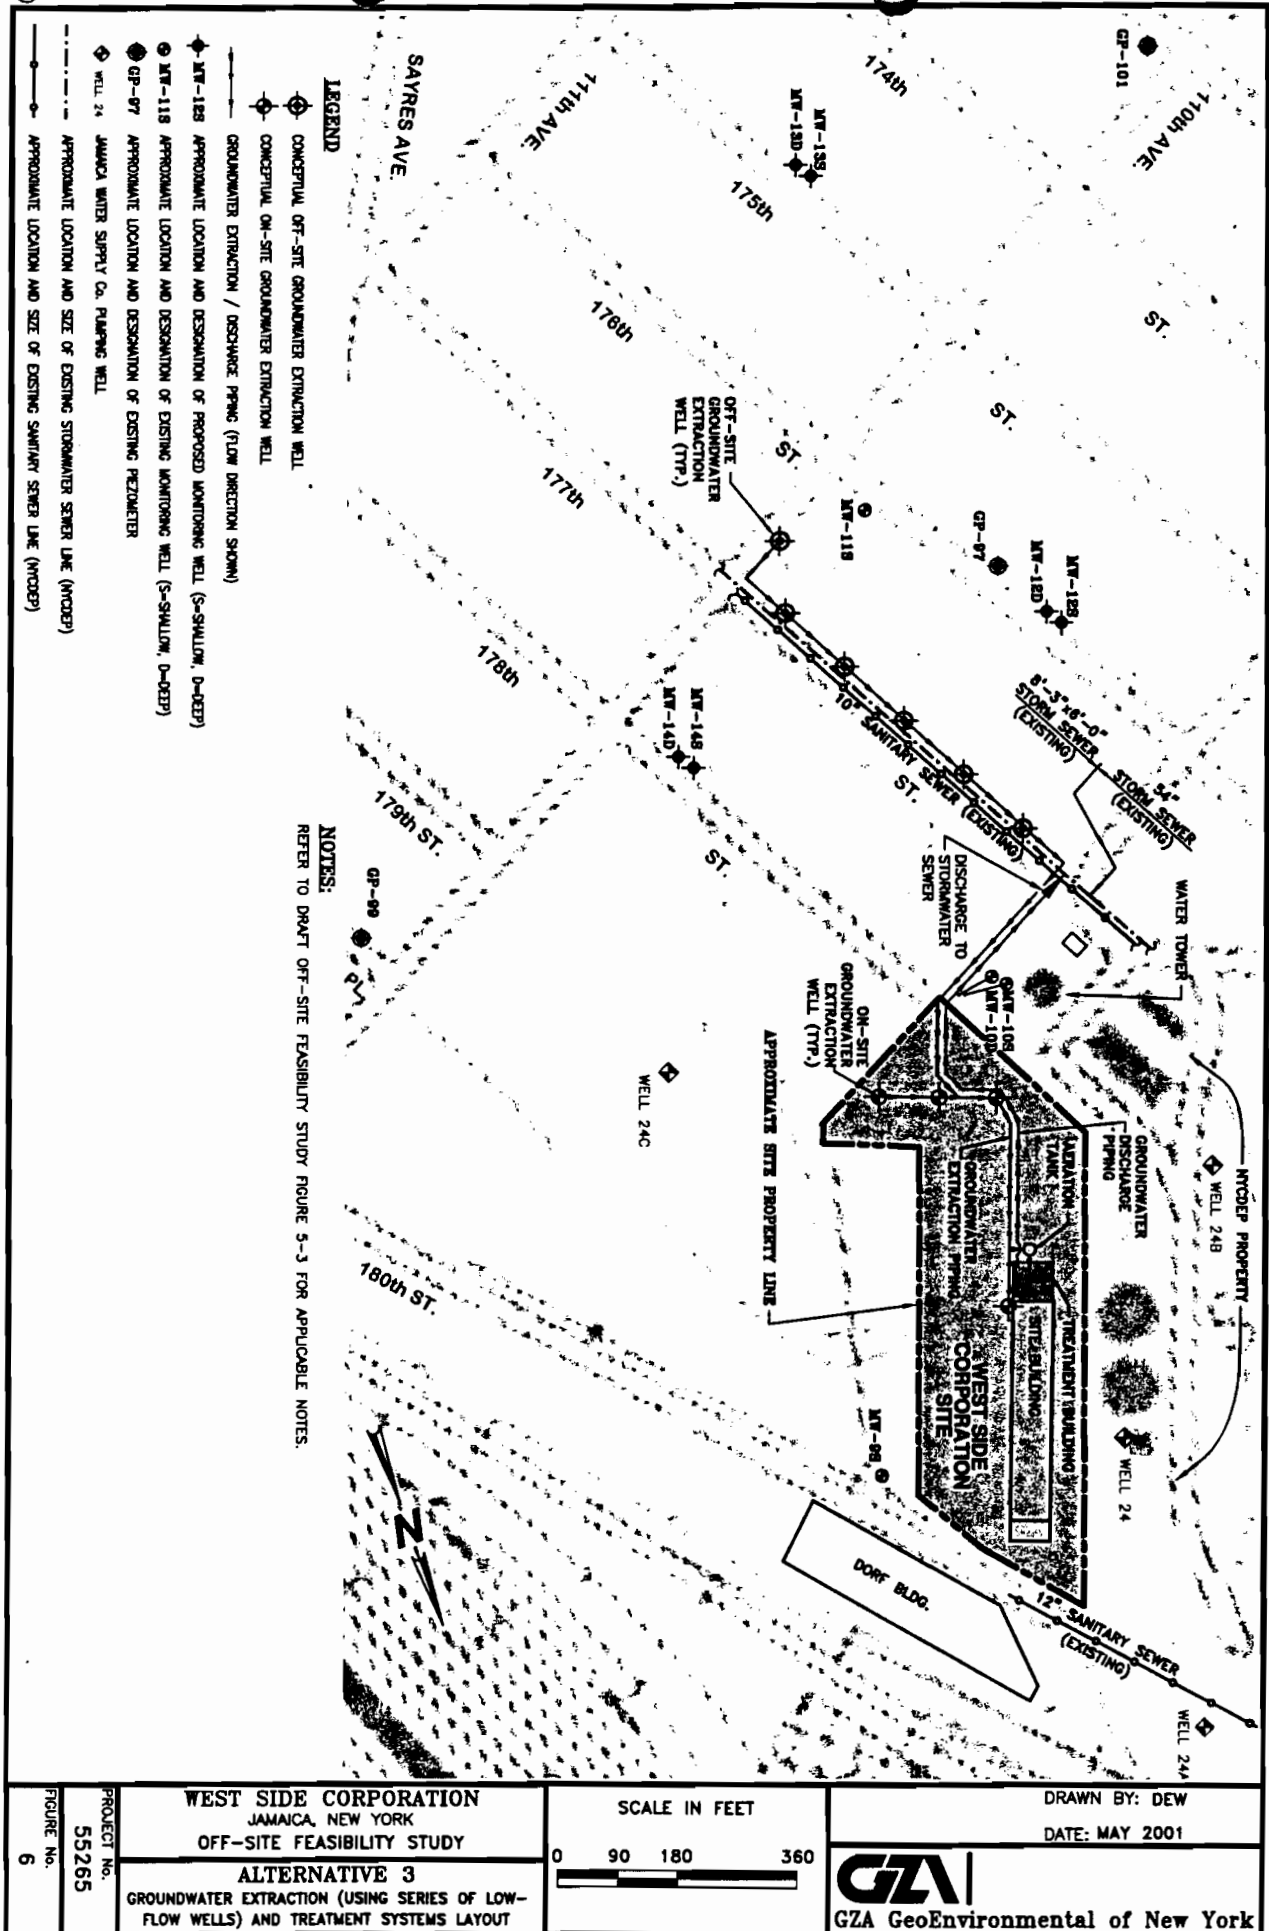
PROJECT NO. 55265	WEST SIDE CORPORATION JAMAICA, NEW YORK	SCALE IN FEET 0 90 180 360	DRAWN BY: DEW
